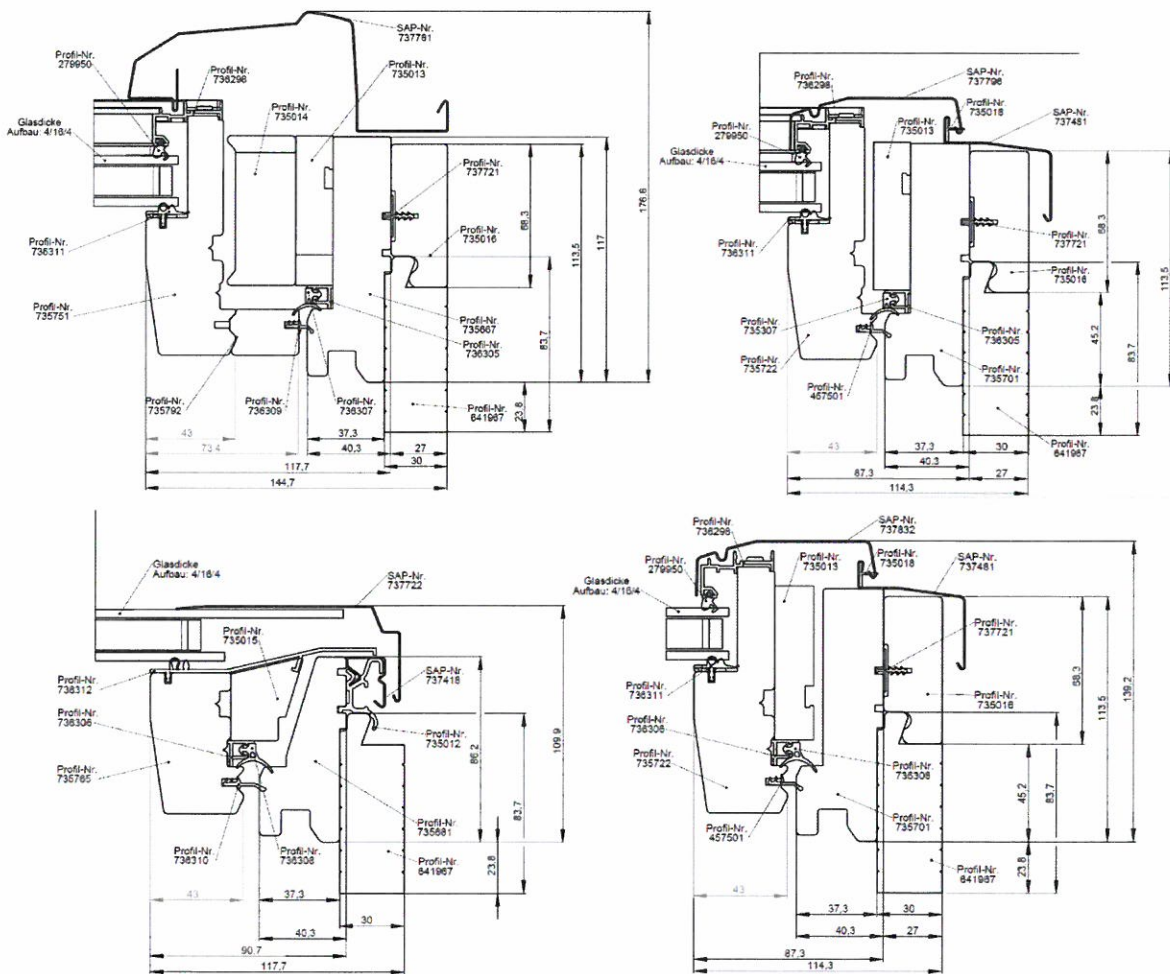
Drawing of wooden roof window, type Q-4...P / QT4...P without ventilation flap
